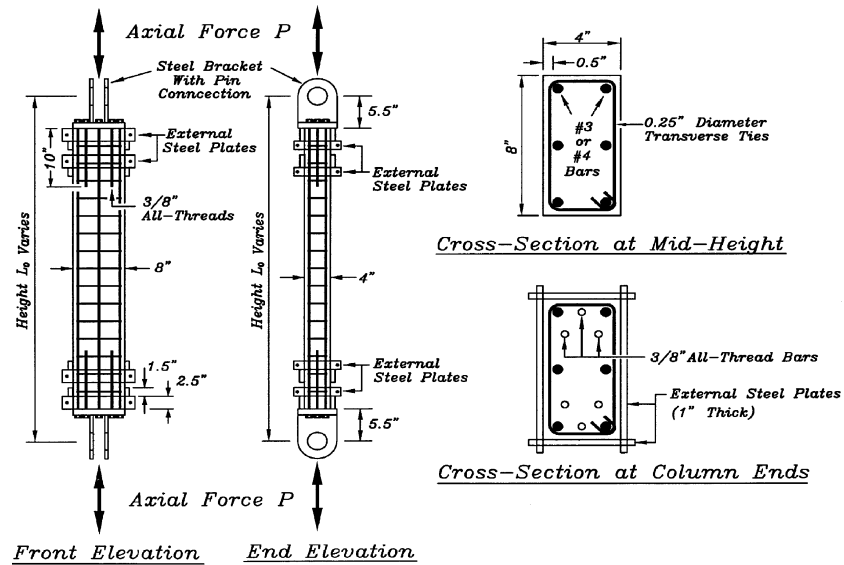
Reinforcement details for test specimens (1 in. = 25.4 mm).
